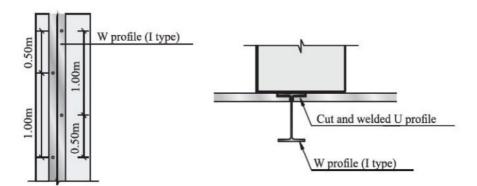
Spacing of the mounting holes in the masonry pillar and detail, in plan, of the U section profile in the vicinity of the pillar and its weld.
